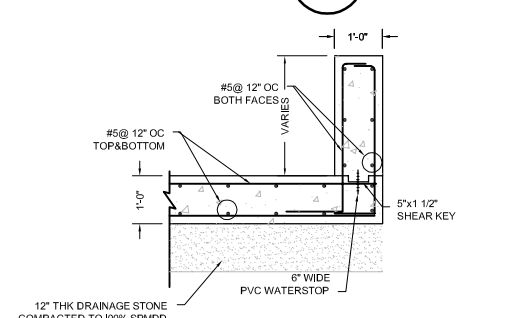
AOI4 AREA CONTAINMENT INLET STRUCTURE
